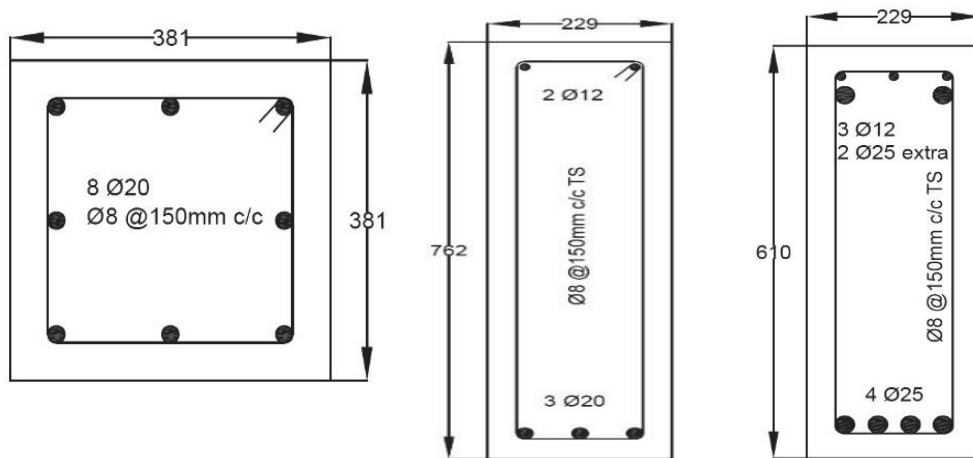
Section of columns (left), first-floor beam (center), second-floor beam (right)
